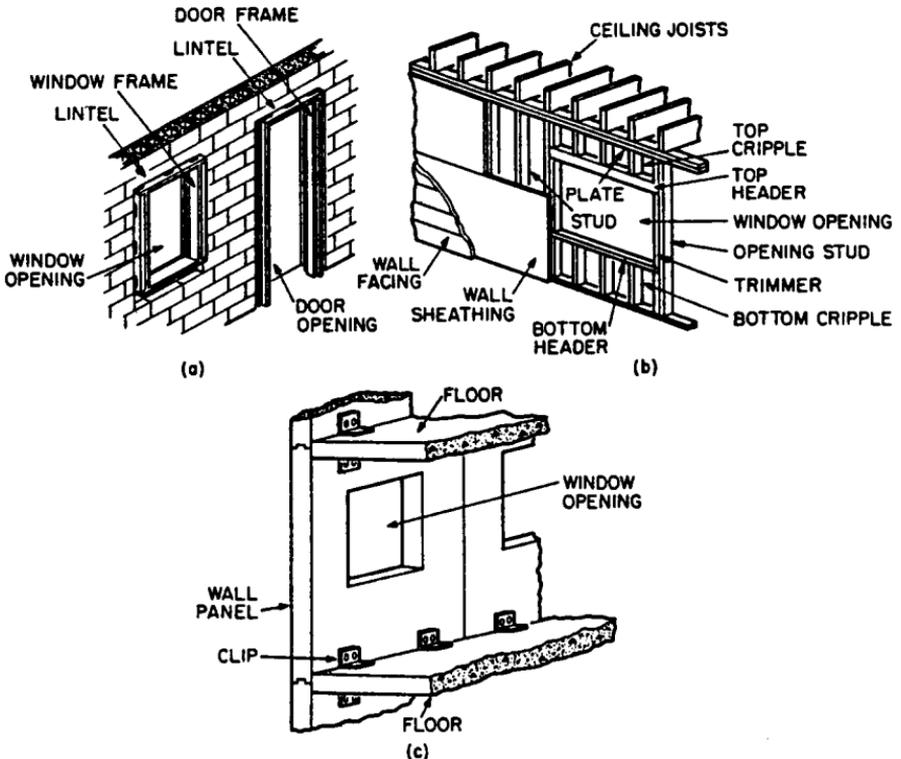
Types of exterior wall construction: (a) concrete-block wall; (b) wood-framed wall; (c) precast-concrete curtain wall.
